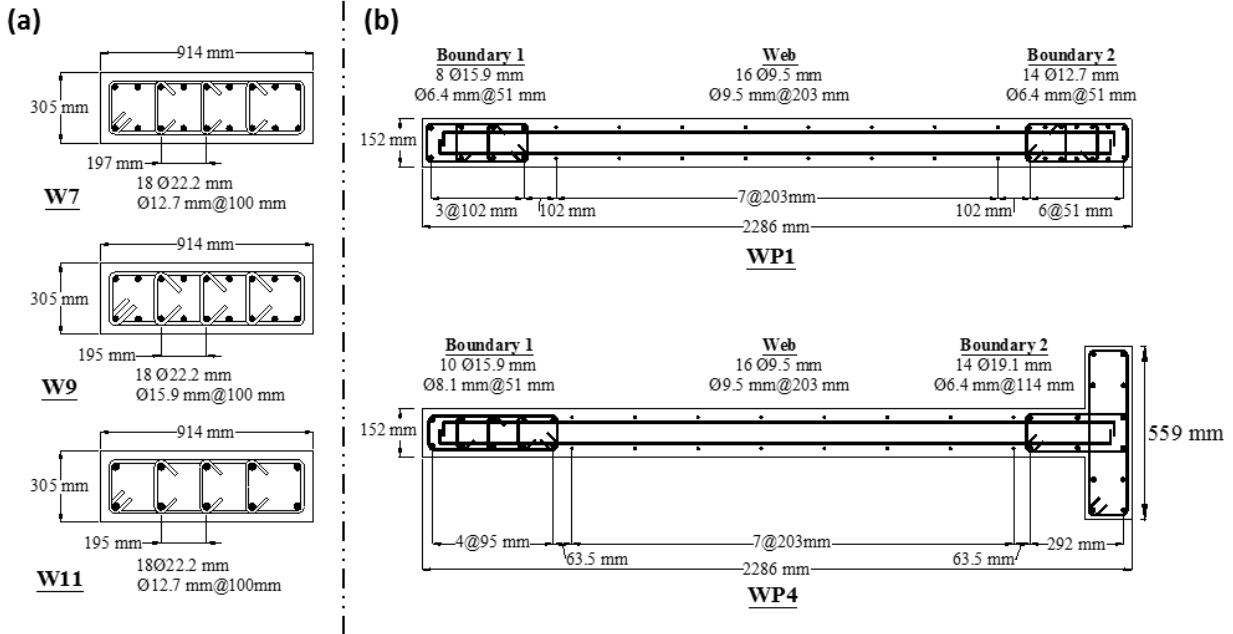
Cross-sectional geometry and reinforcement for (a) isolated boundary element specimens; and (b) wall panel specimens. Note: 1 in. = 25.4 mm.
